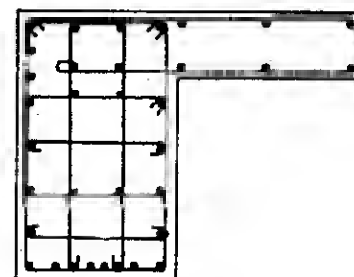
Typical Reinforcement Around an Opening *a*.
